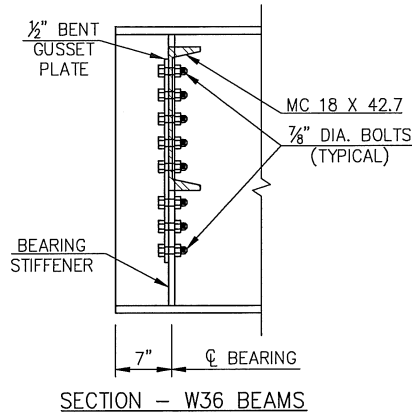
DETAILS SHOWN AT INTERIOR BEAM. OMIT BOLT HOLES ONLY IN BEARING STIFFENERS AT OUTSIDE FACE OF EXTERIOR BEAMS.
